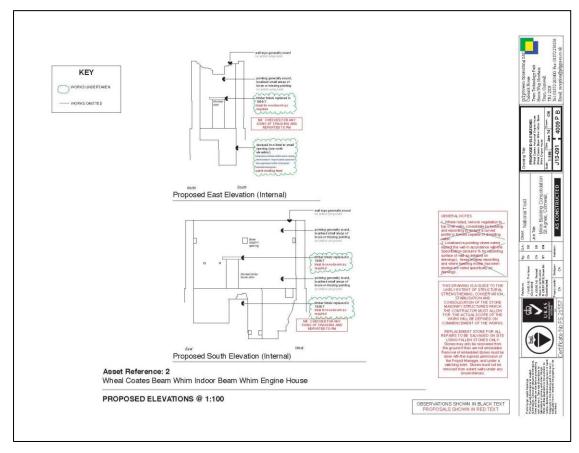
Southern and eastern internal elevations of Wheal Coates beam whim.
